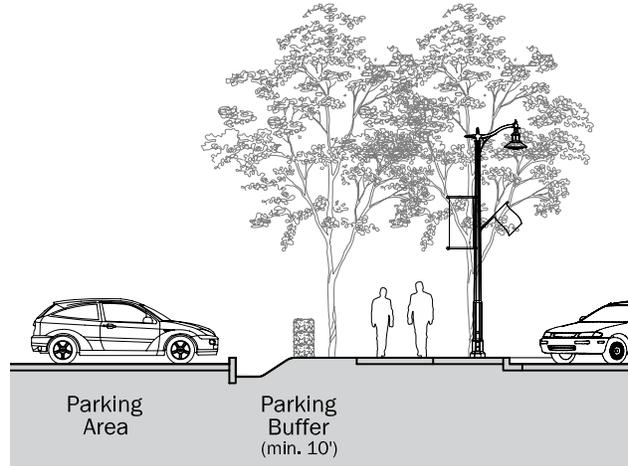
D.4: Potential design of the parking area perimeter screening landscaping, with ground level plantings, trees and shrubs. A bioswale (optional) is shown and may be included in the perimeter screening.
